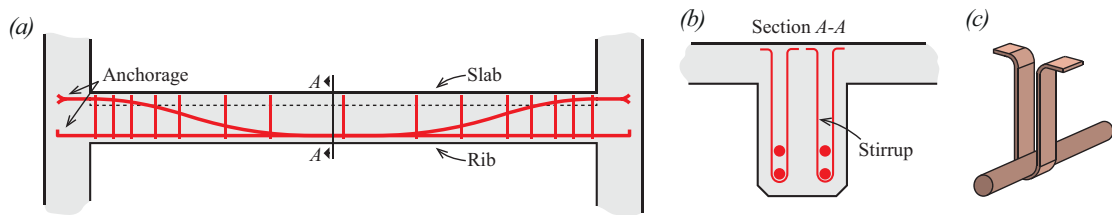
Reinforcement layout patented by Hennebique: (a) shape of the longitudinal rebars and disposition of the transverse reinforcement; (b) correct placing the reinforcement in the cross-section of the rib; (c) detail of the stirrup (adopted from [101])
